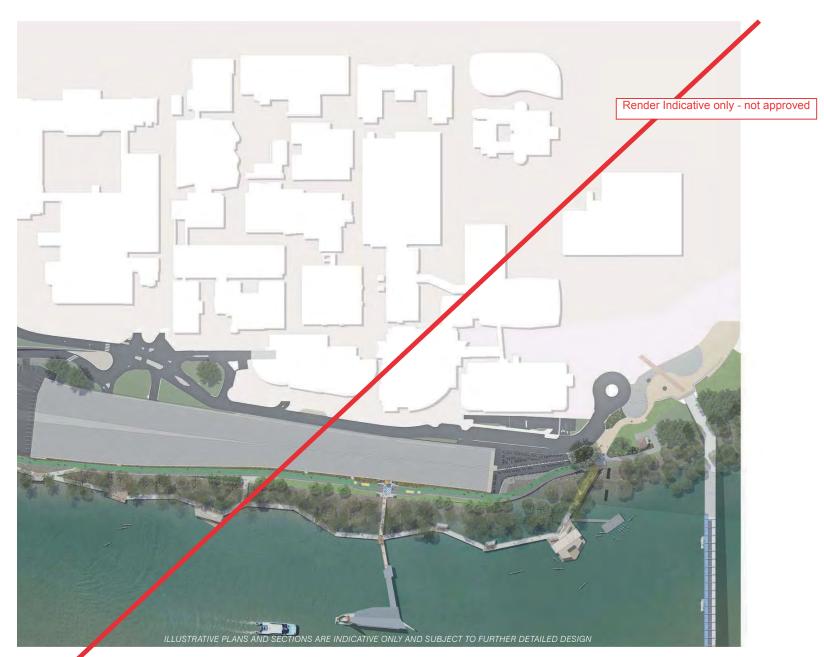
Streetscape Elevations and Sections Key Plan (rendered plan behind indicative only)
